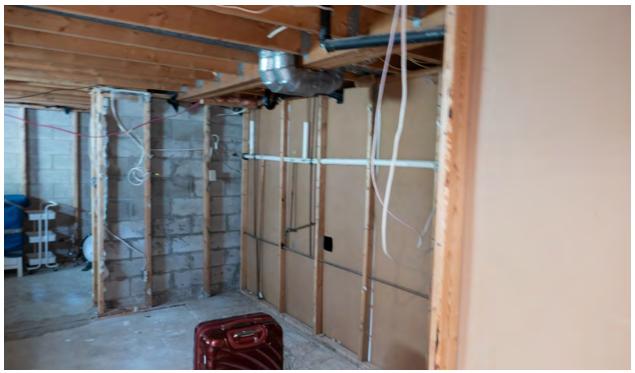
Modern framing and concrete block foundations in the basement (CBCollective, 2023).
